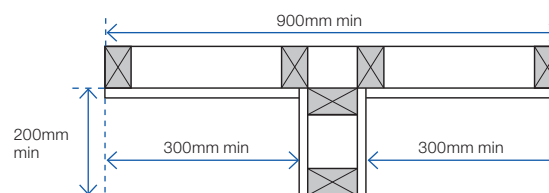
WALL INTERSECTION (GIBFix® FRAMING SYSTEM)
